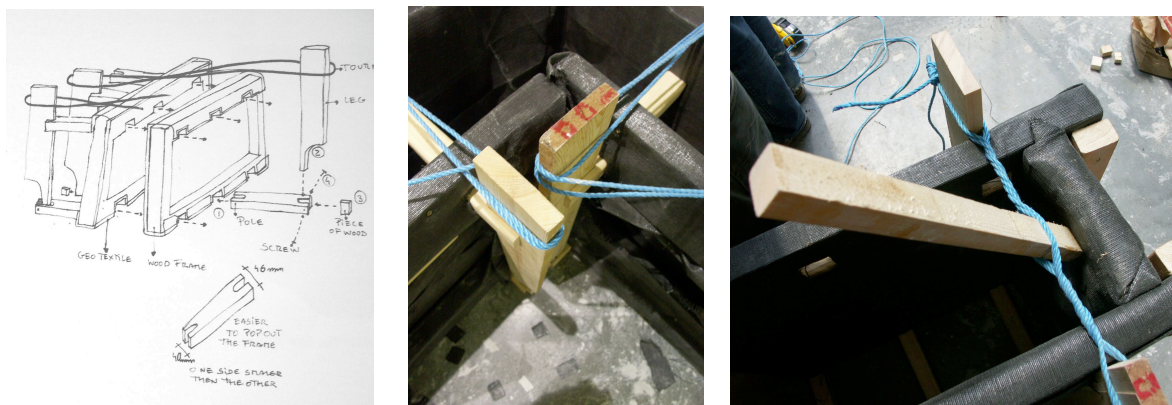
Fabric panel system for climbing rammed earth walling 2006, images M. Da Silva, A. Chandler
